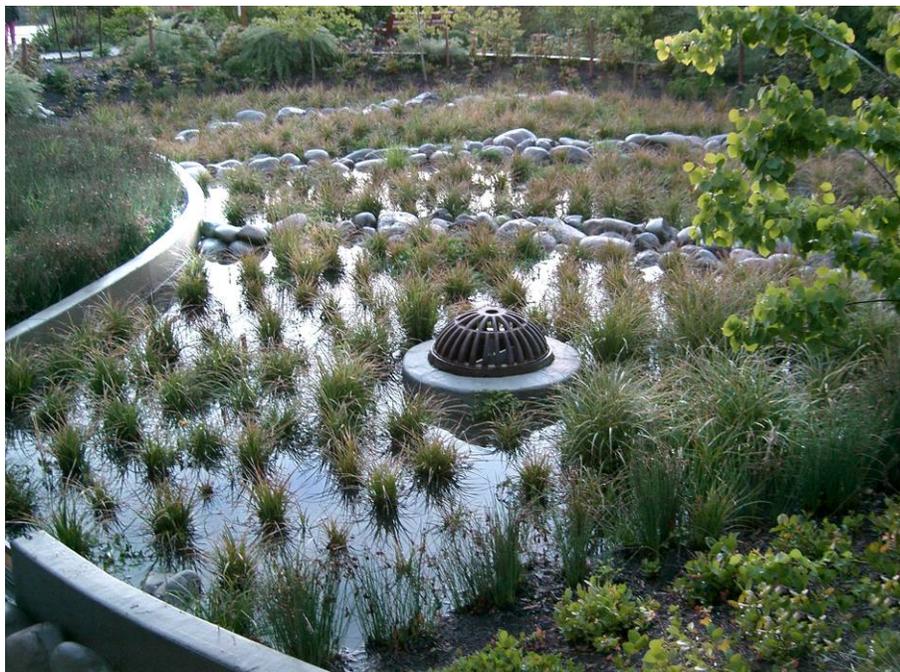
Glencoe School Infiltration Basin. See [Appendix G.1](#), SW-140, for typical basin details.
